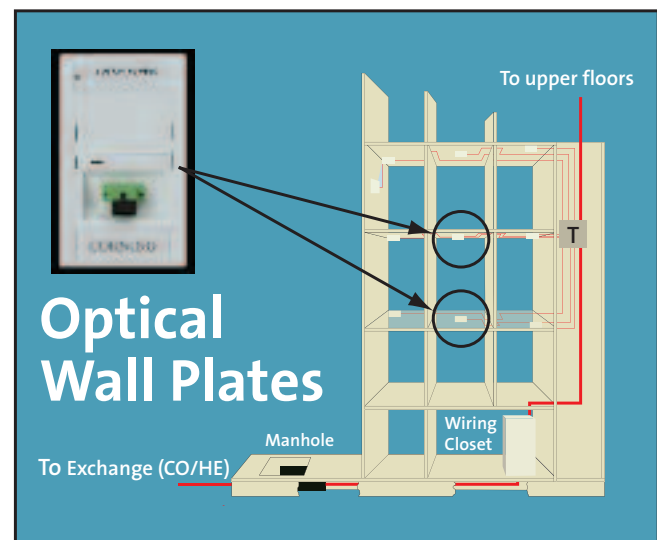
OptiWay Wall Outlets | Drawing ZA-3096
